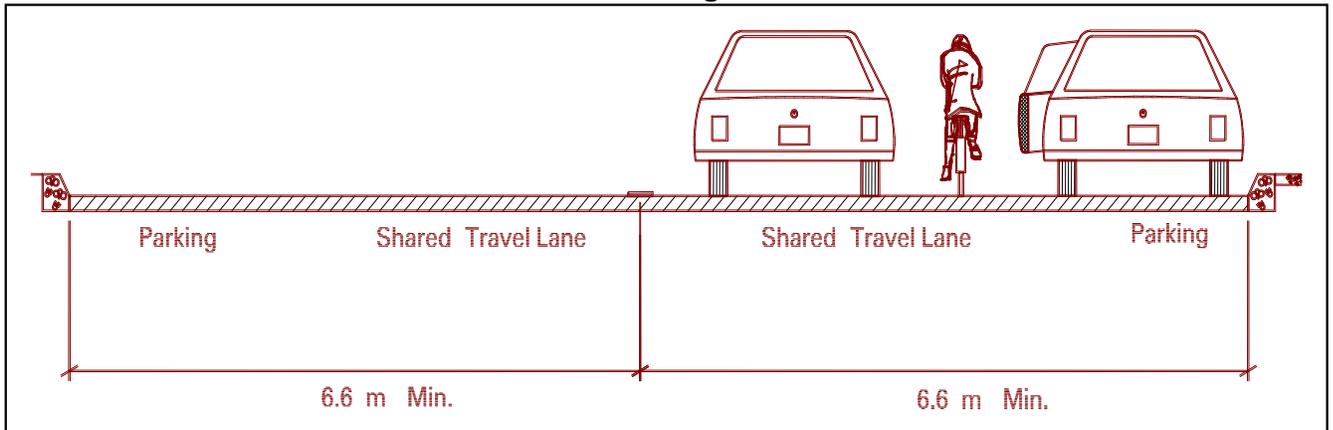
Wide Curb Lane with On-Street Parking
